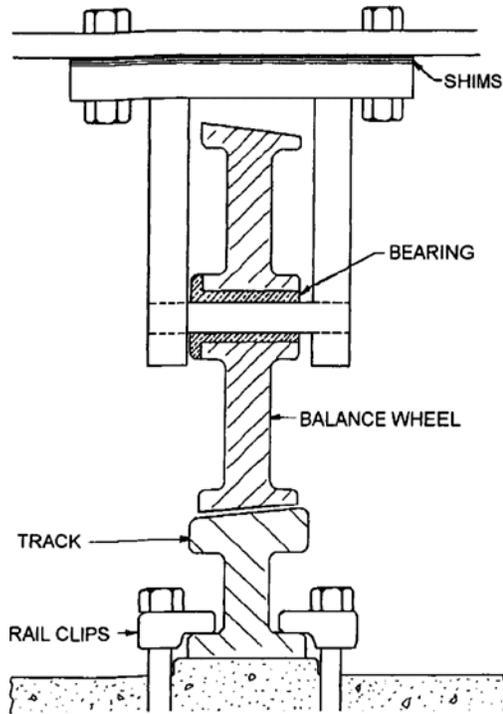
A balance wheel assembly in which the wheel rotates on a stationary shaft
